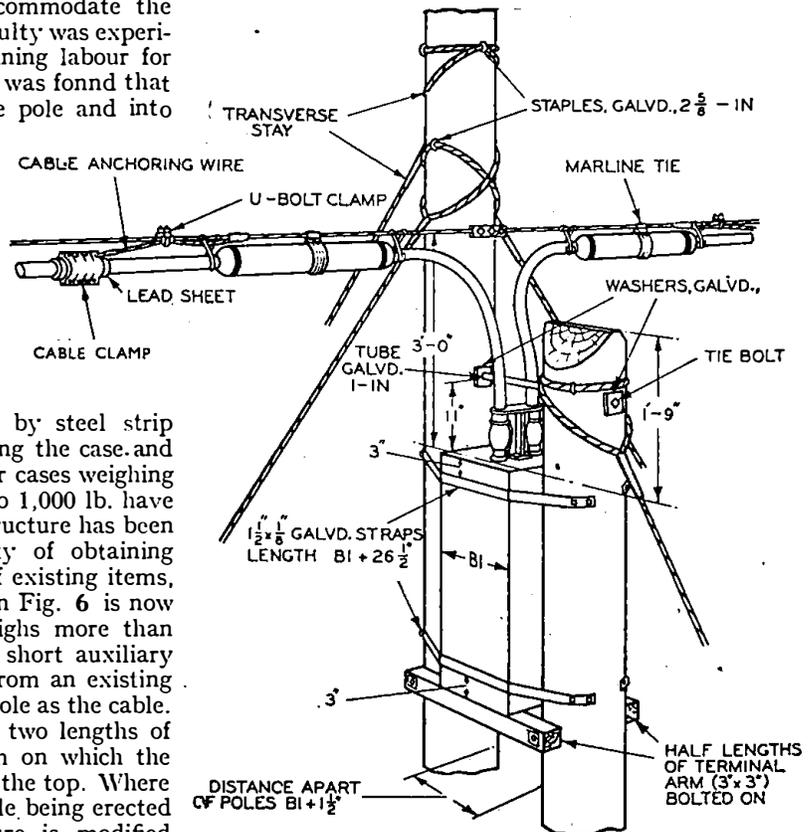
MOUNTING OF LOADING COIL CASE.
